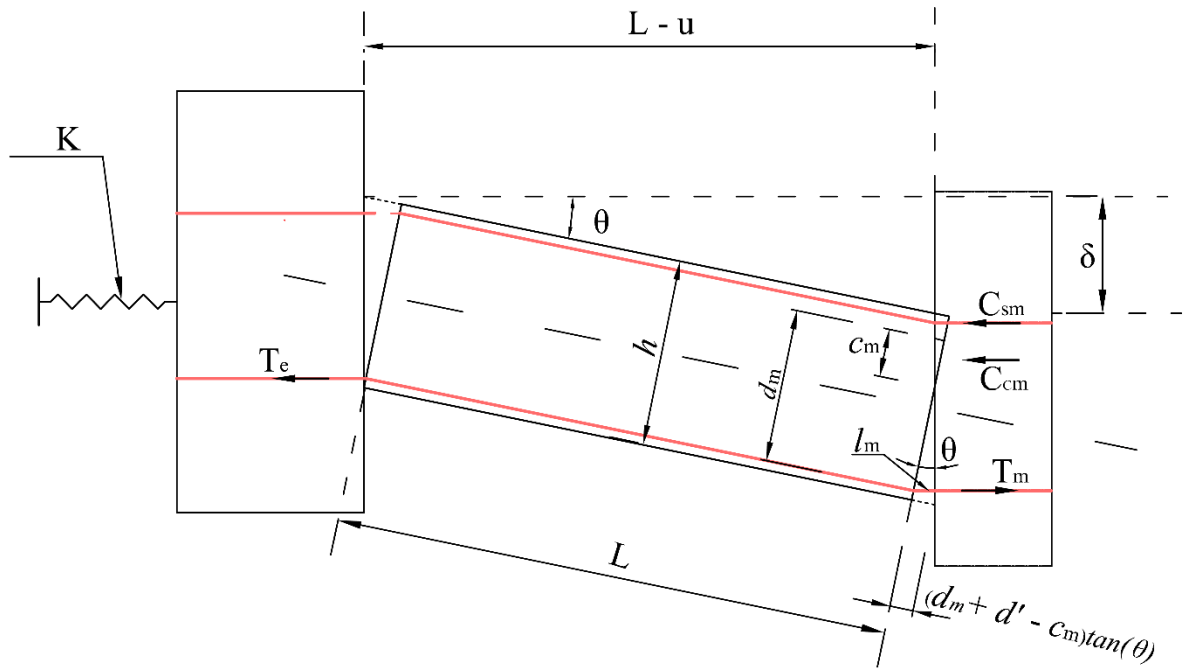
Deflected shape of a single bay beam after bar fracture at the beam end.
